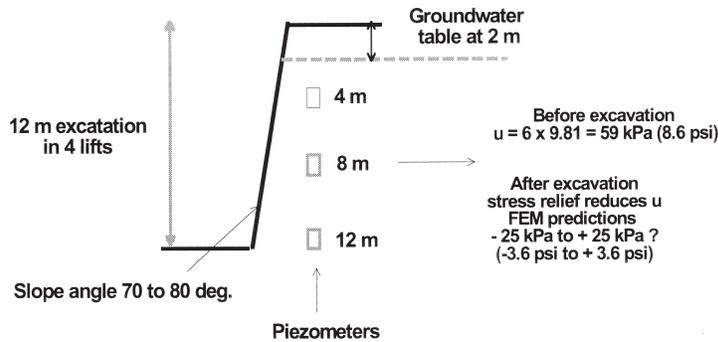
Typical cross section - Main works (Chainage 1320 W).
